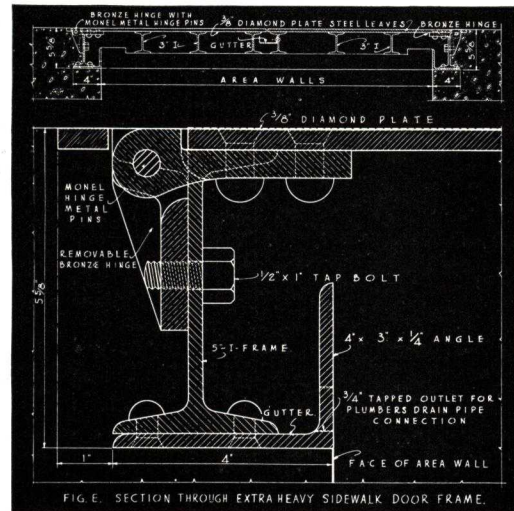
FIG. E. SECTION THROUGH EXTRA HEAVY SIDEWALK DOOR FRAME.
